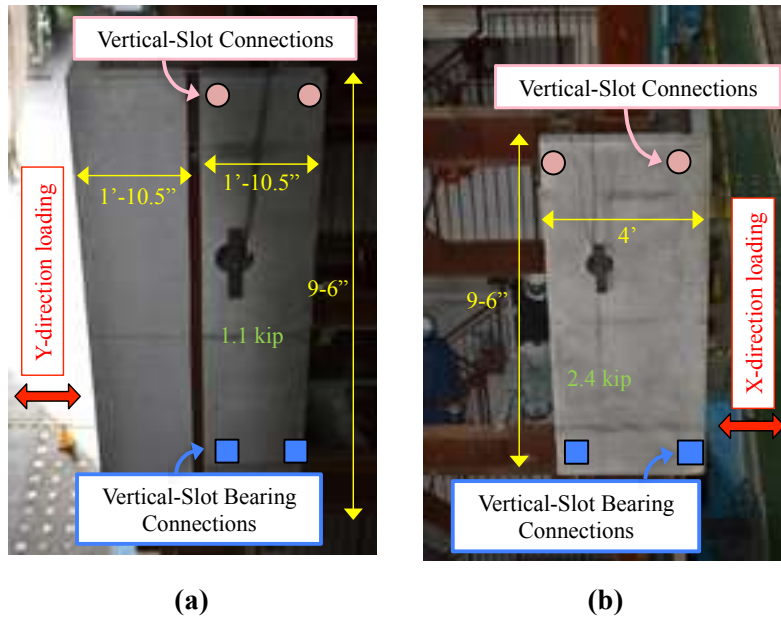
APC panel geometry and layout for the E-Defense test: (a) flat panel and (b) return panel.
